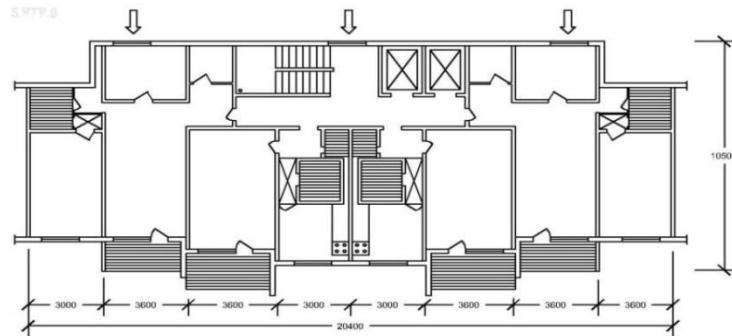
Four-apartment section on the side of non-residential premises of apartments in a 9–12-storey barrier-type residential building (plan of a residential building with high sound-insulating performance).
